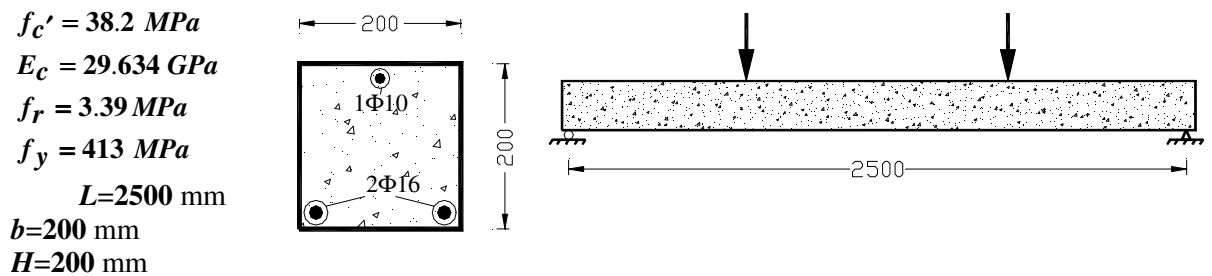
Details of a reinforced concrete simply supported beam under two point load with $(L/H=12.5)$ (Al-Zaid, et al.)
